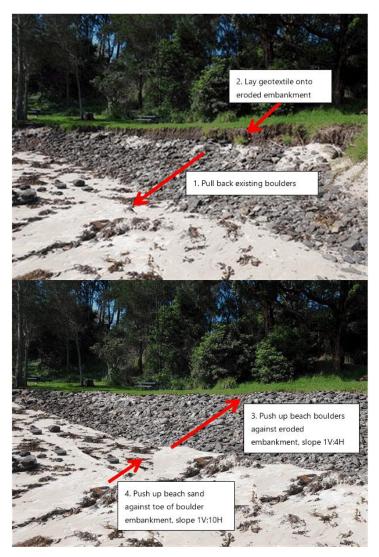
East of Boat ramp, Top – existing; bottom – proposed (photo digitally altered). Proposed steps for remediation numbered on figure.
